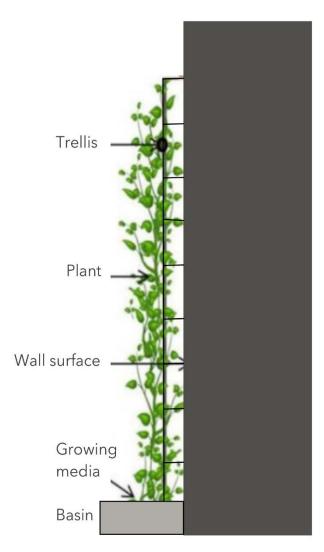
Green Façade with a Cable Wire System (source: authors)
